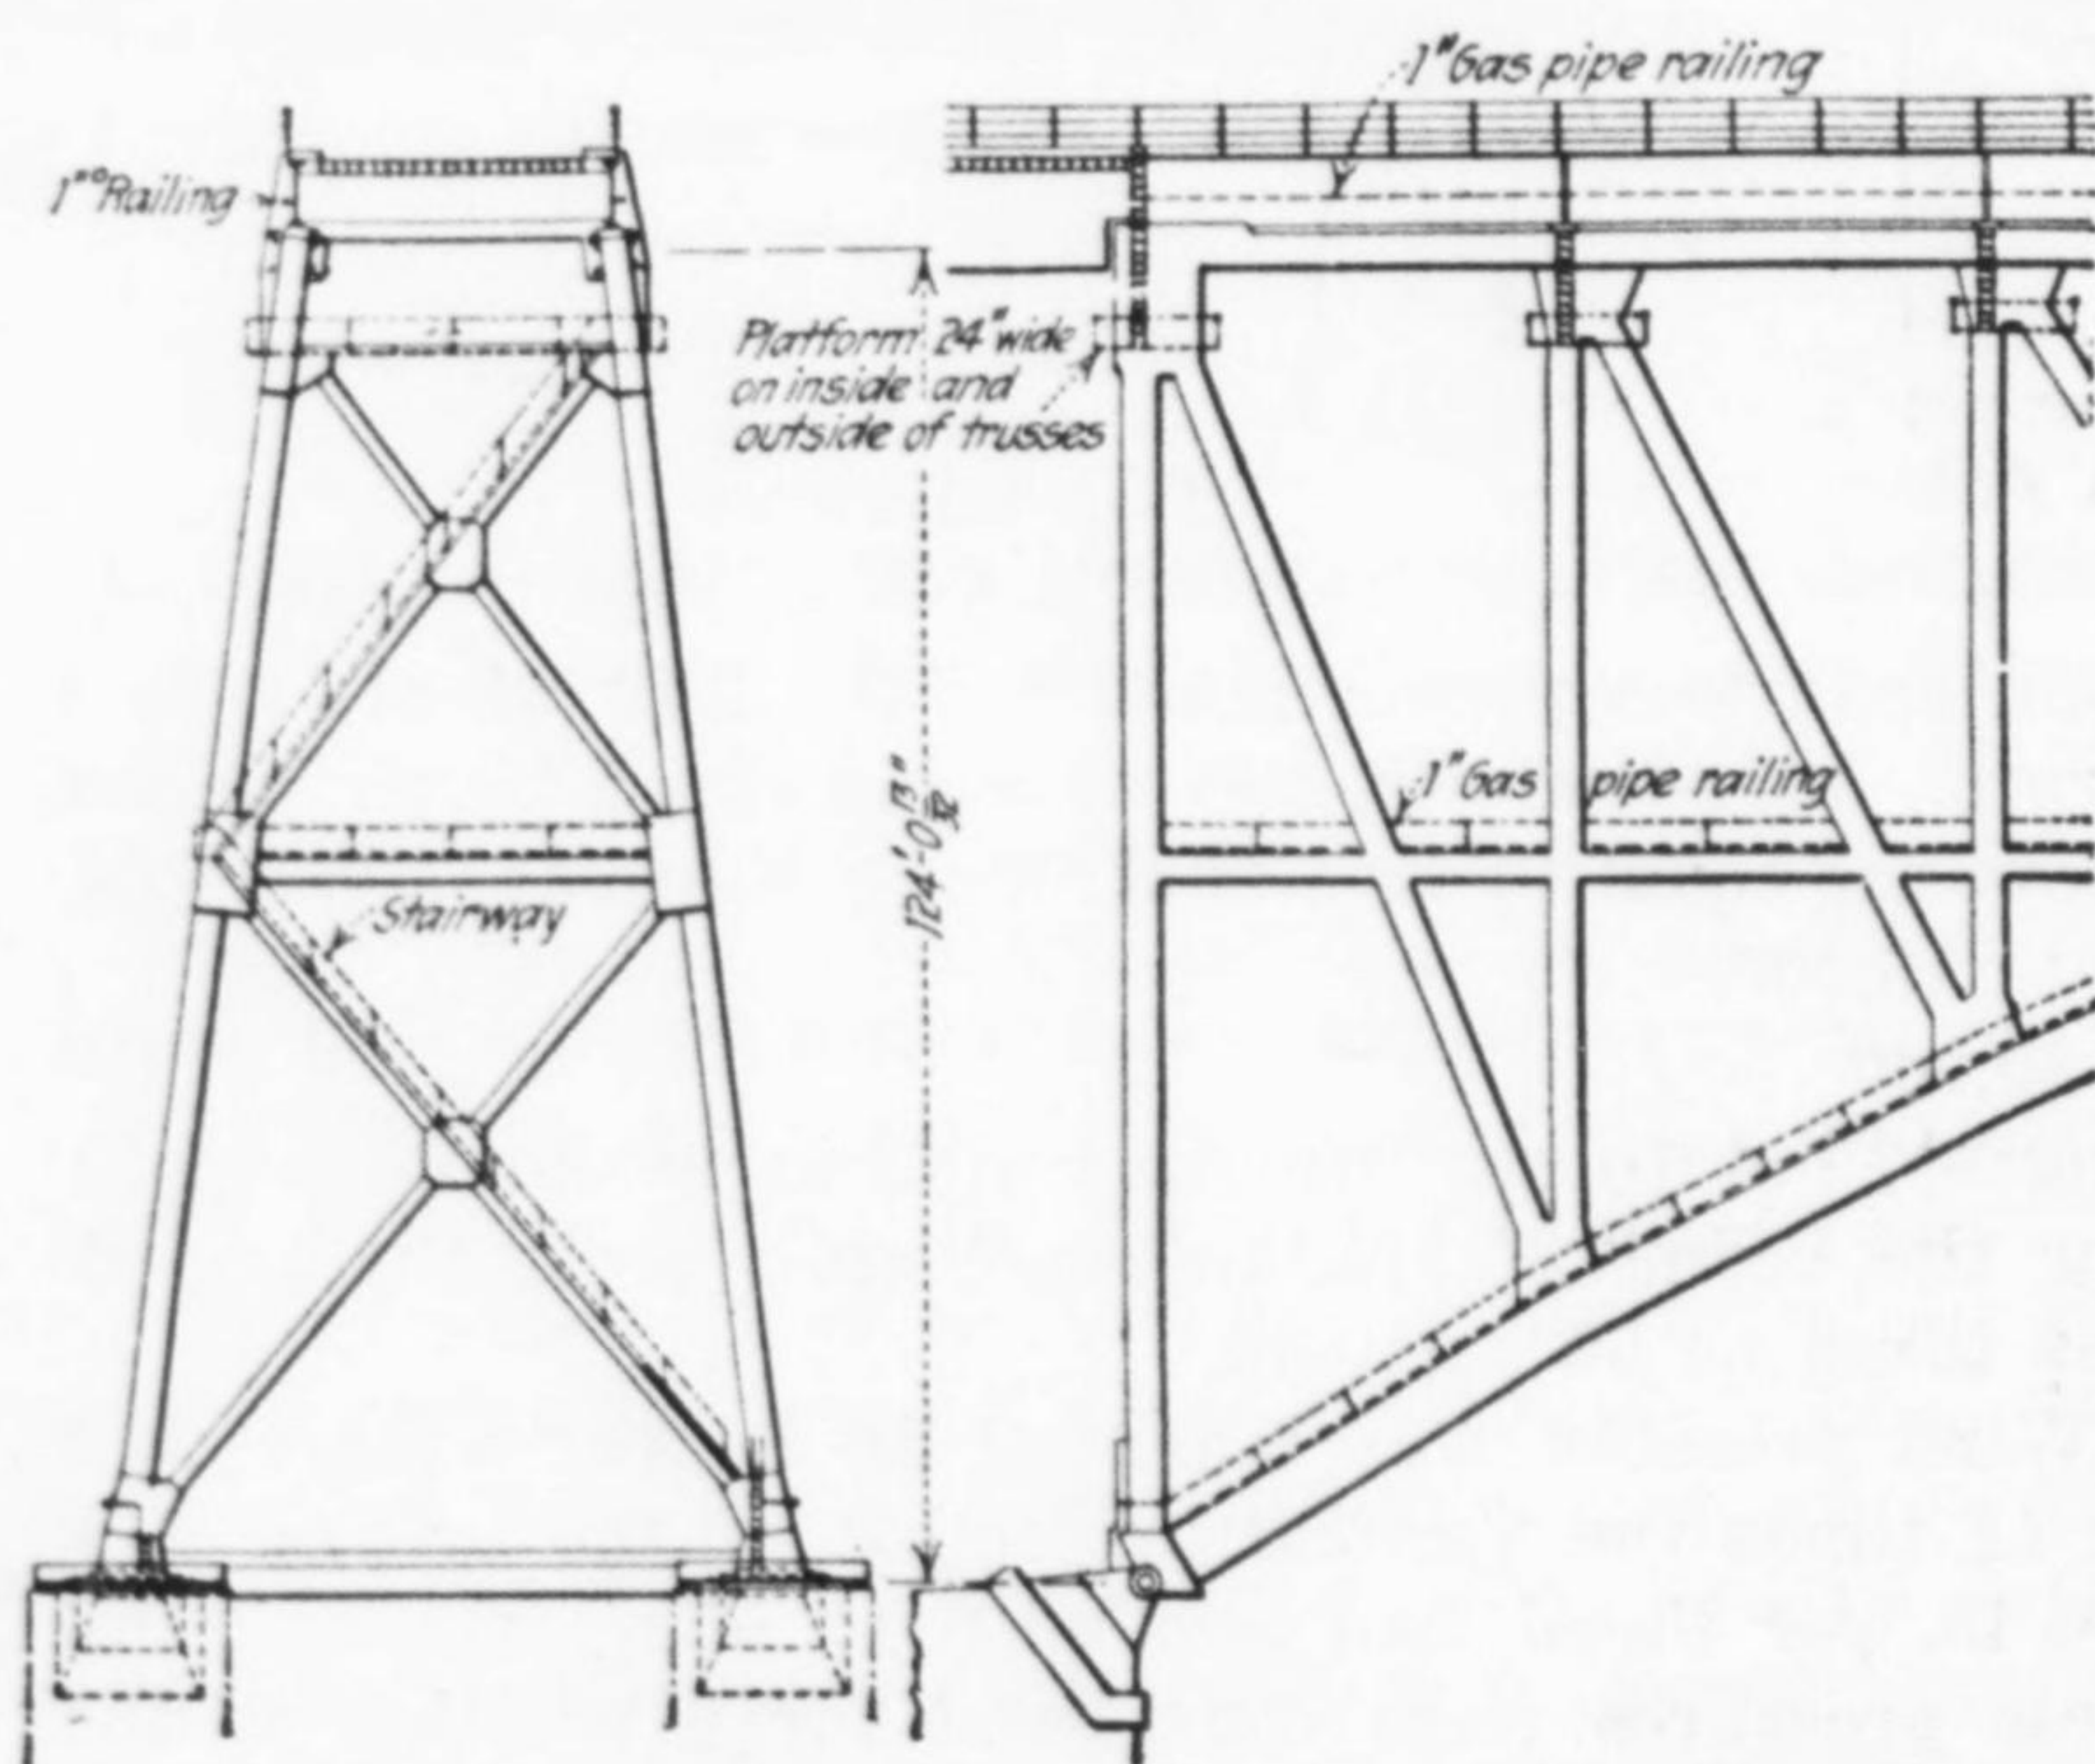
INSPECTION LADDERS AND PLATFORMS
